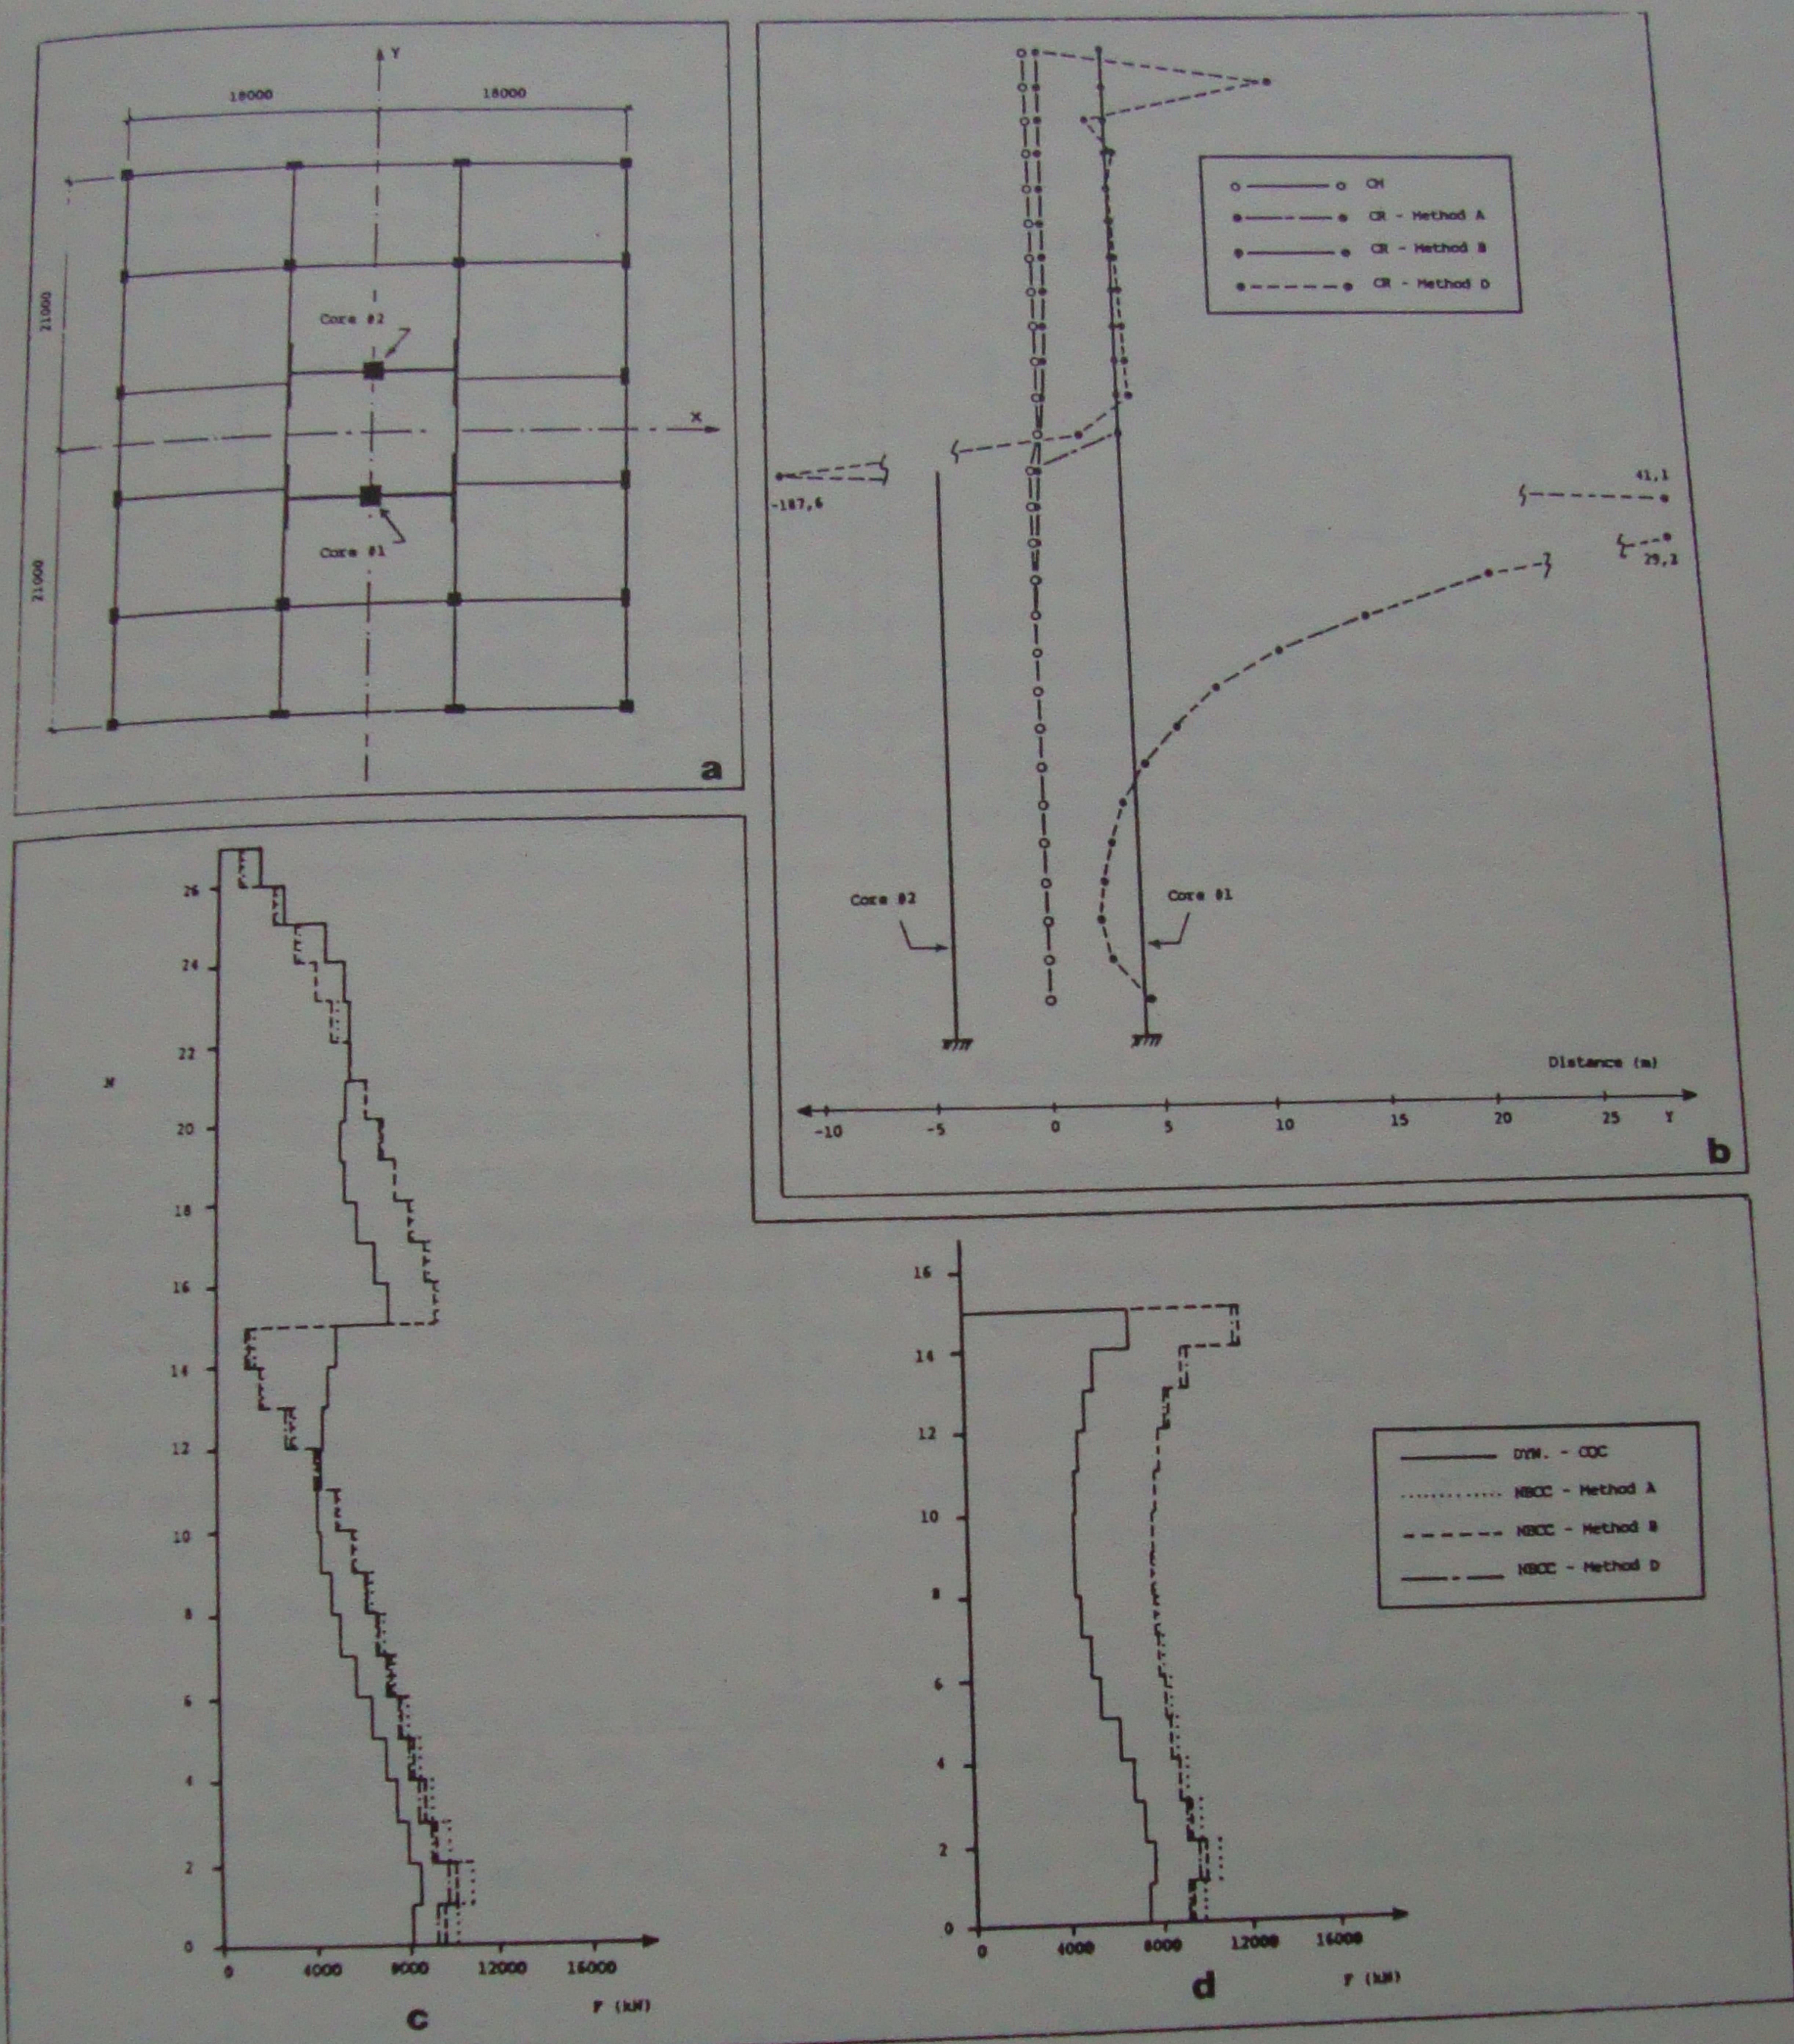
Building 2 - 27 stories. (a) plan; (b) position of CM and CR; (c) shears in core #1; (d) shears in core #2.
